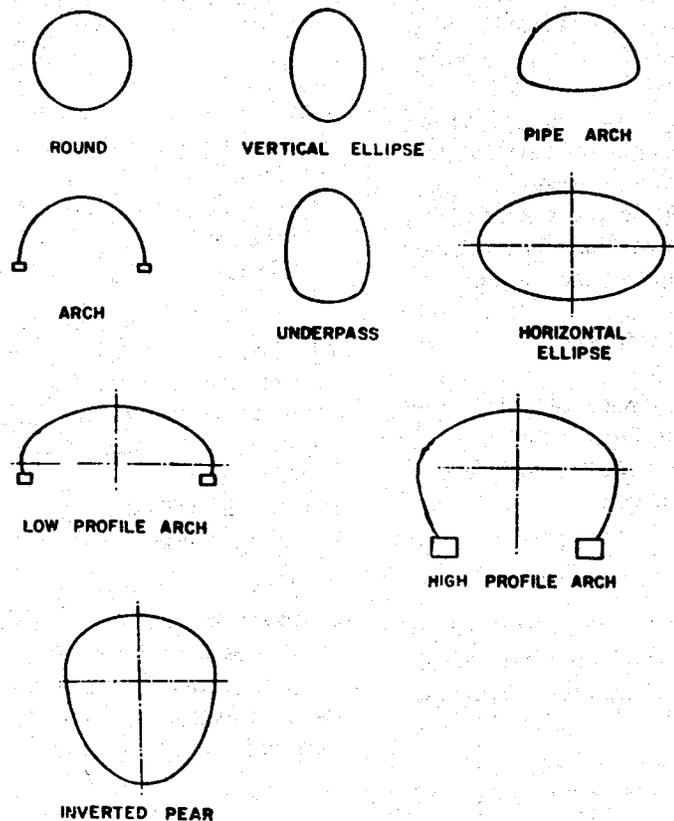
A. Standard Terminology of Structural Plate Shapes Including Long-Span Structures
